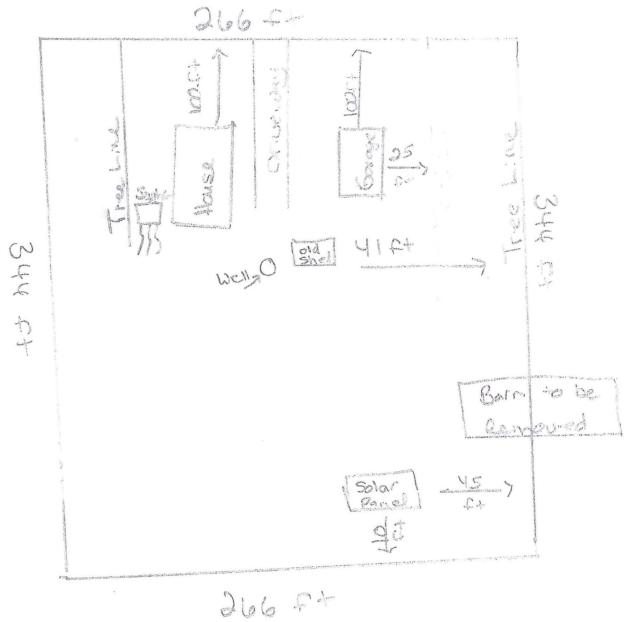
Applicants' Sketch - Proposed Lot to be Retained File Nos. B24-91-1, OP24-19-1, ZN1-24-26 and ZN1-24-27 (Mensink/Baker and Hoffer) Lot 5, Concession 6, Township of Blandford-Blenheim 806046 Oxford Road 29
